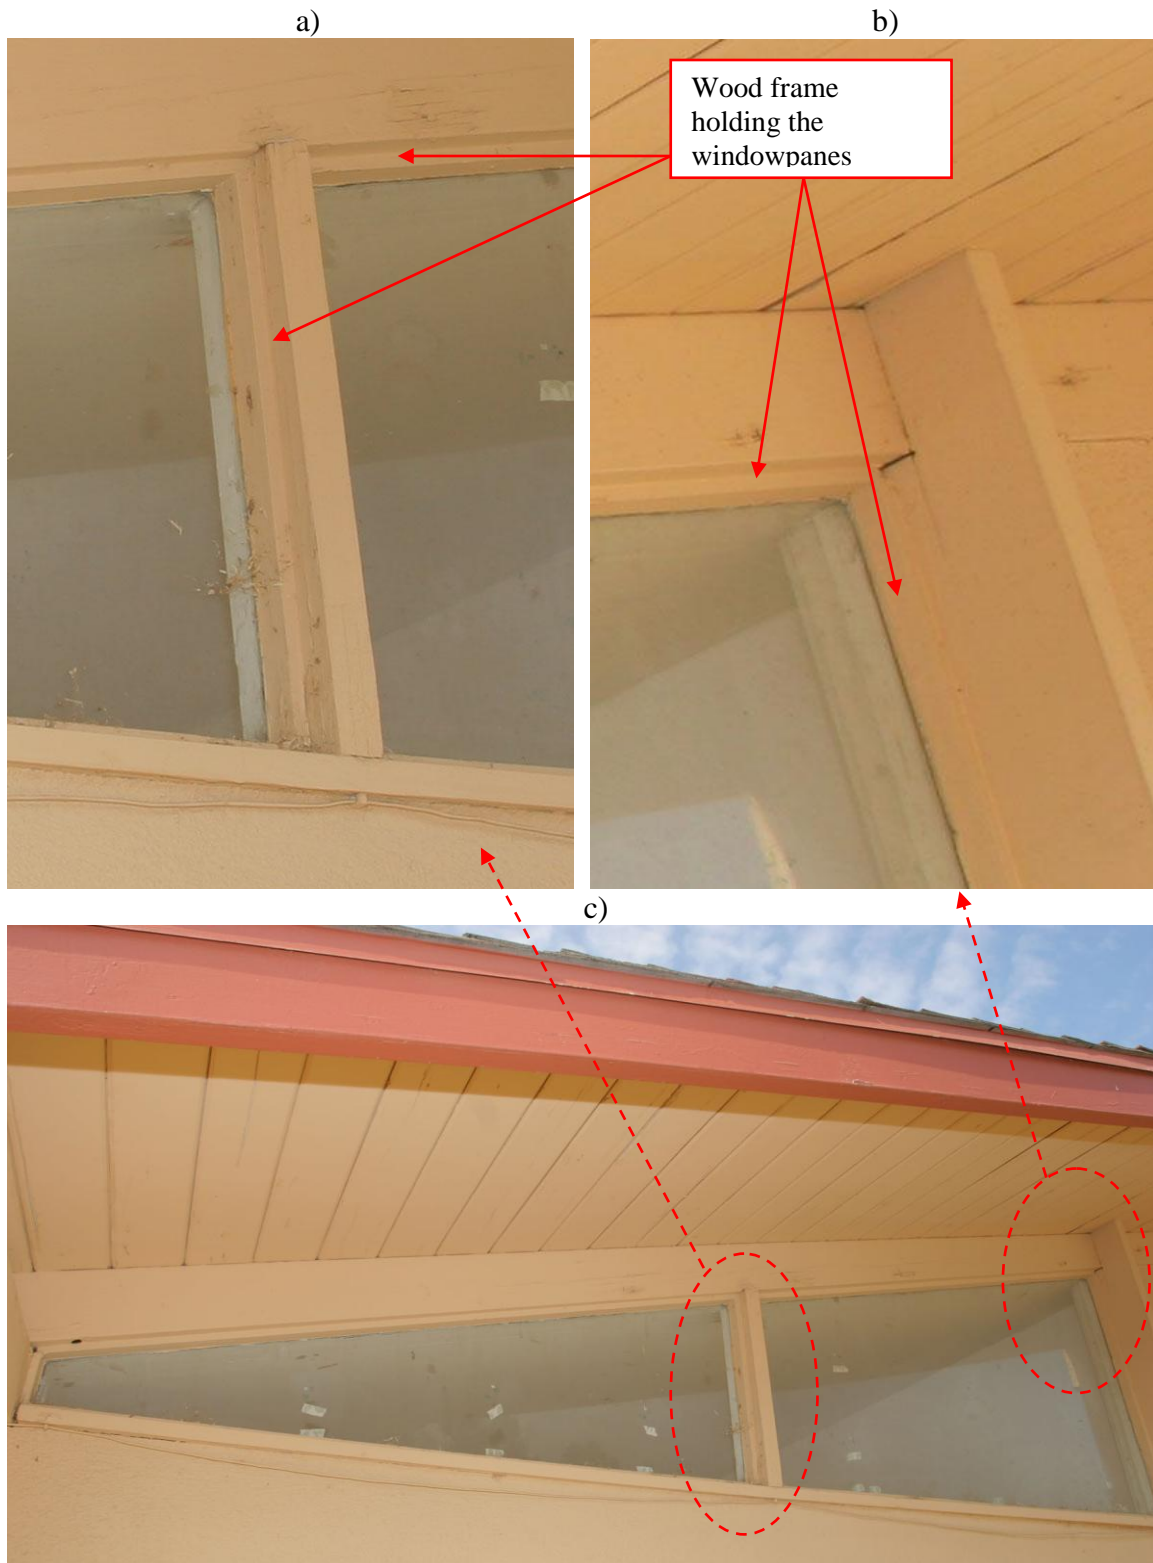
a) Window detail of the windows in the north wall of both structural acoustic measurement rooms, b) detail of the frame holding the glazings, c) looking at the windows from outside the house.
